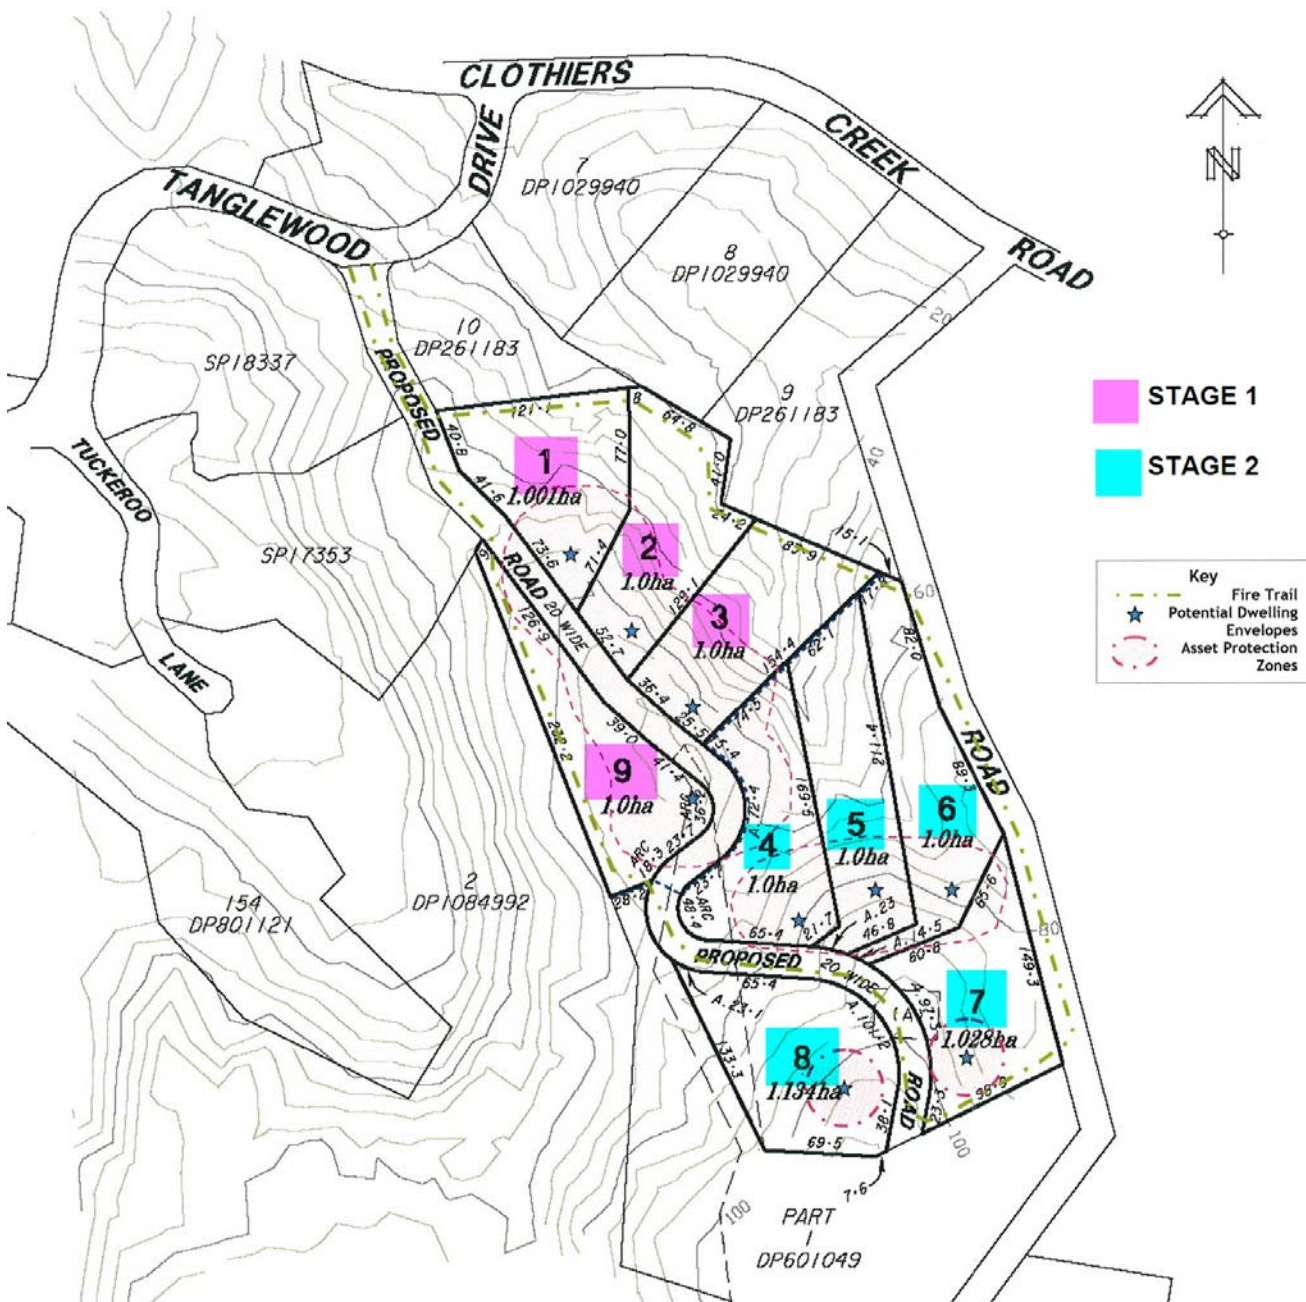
Proposed plan of subdivision (coloured staging areas added for clarity)
